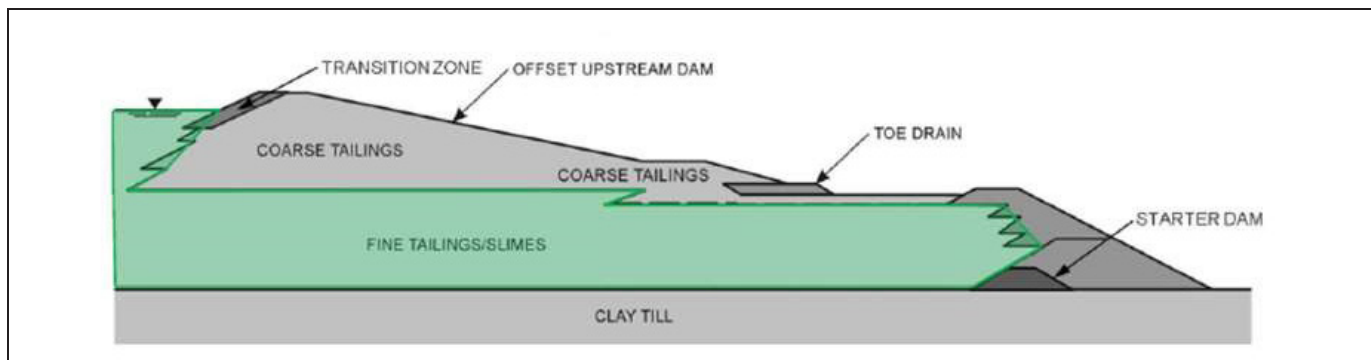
Hibbing Taconite Company Tailings Facility Impoundment Dam Typical Cross Section
